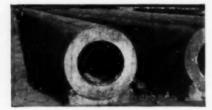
Cylindrical Piles on Concrete Mould-base.
